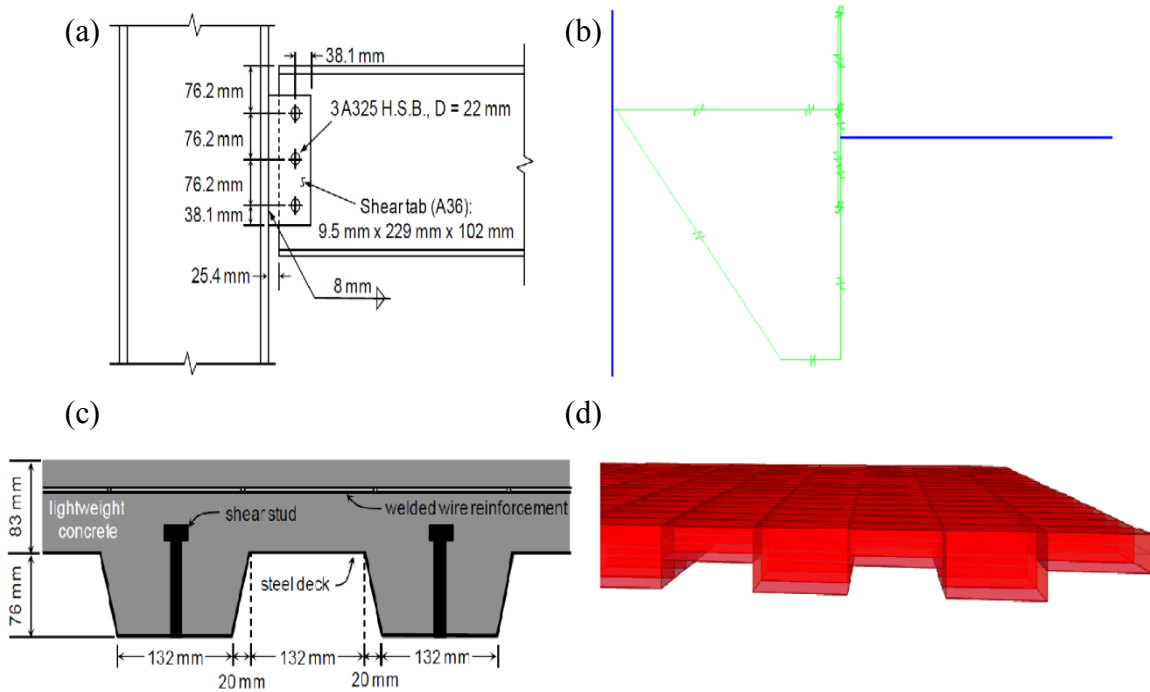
Detailed and simplified models: (a) details of single-plate shear connection (From Main and Sadek (2012)); (b) simplified single-plate shear connection model; (c) cross sectional view of the floor slab (From Main and Sadek (2012)); (d) simplified floor slab model.
